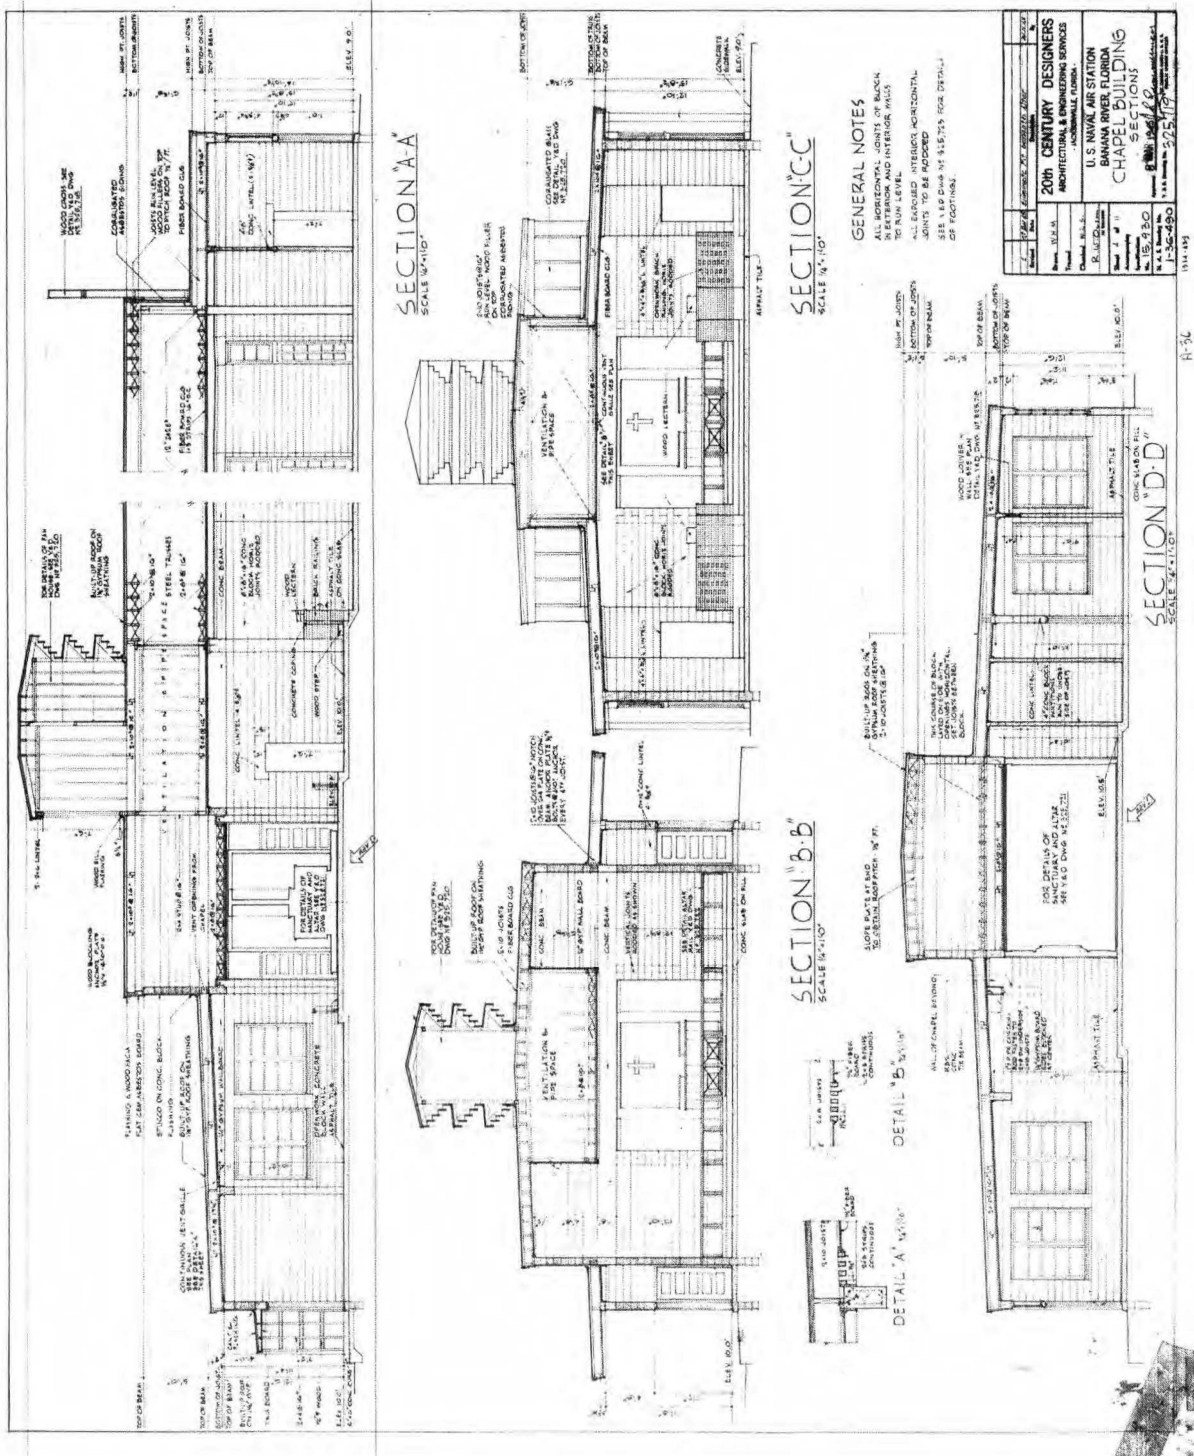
Sections, Chapel Building, U.S. Naval Air Station Banana River, Florida, 8 March 1945.
